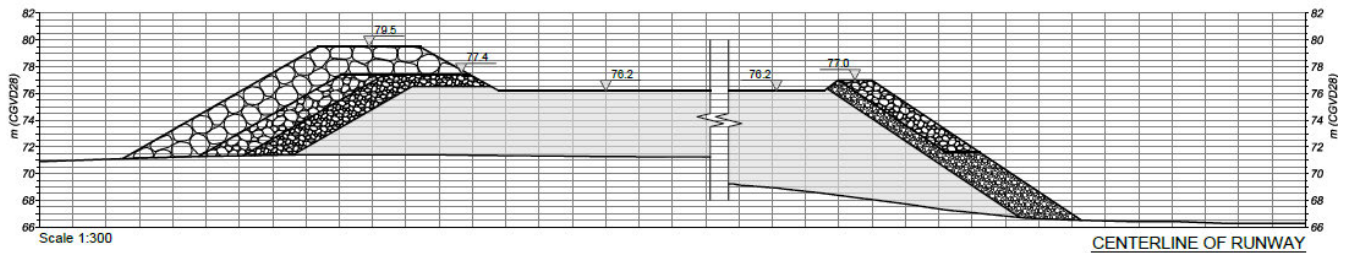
Typical Armour stone Breakwater/Revetment Technical Section
